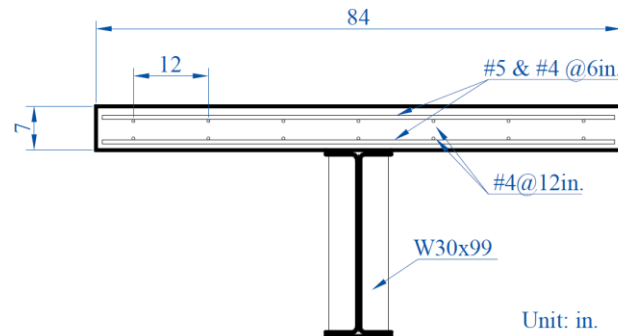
Test Setup and Results from Large-Scale Testing of Simply Supported Girders Strengthened with Post-Installed Shear Connectors (Kwon 2008)
